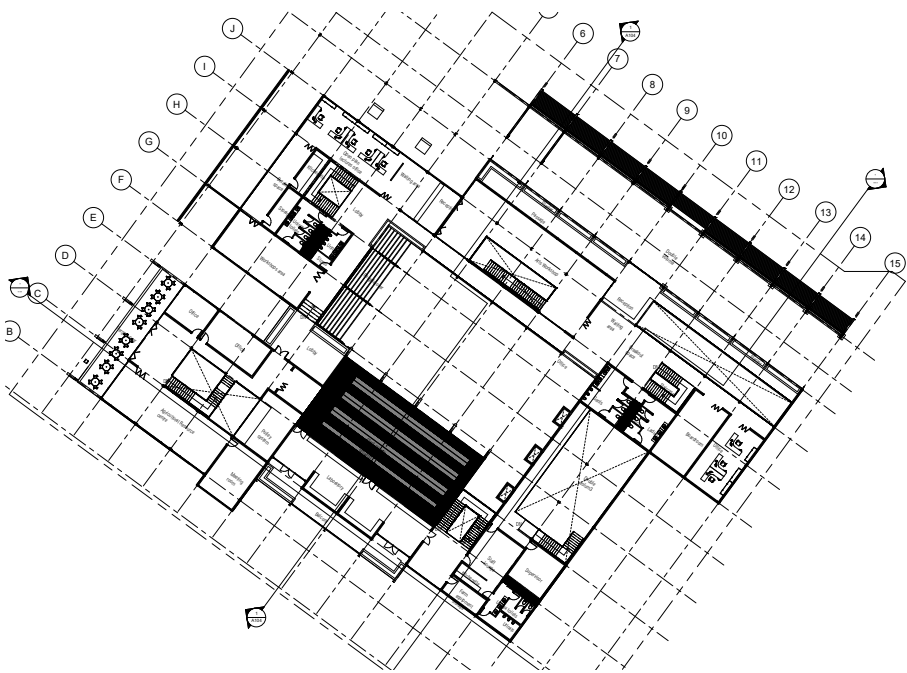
Iteration 7 First floor plan (Author,2020)
